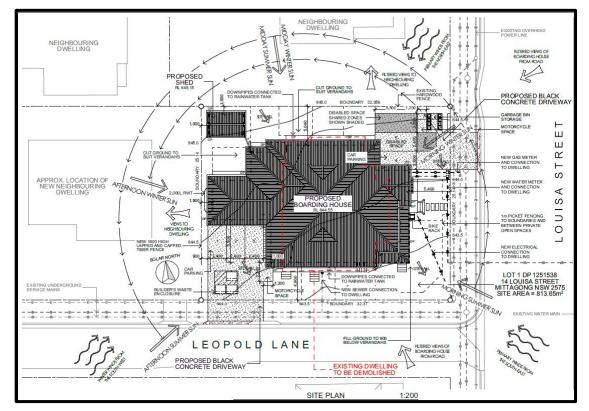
Proposed Site Plan (Attachment 2 (Source: Applicant))
